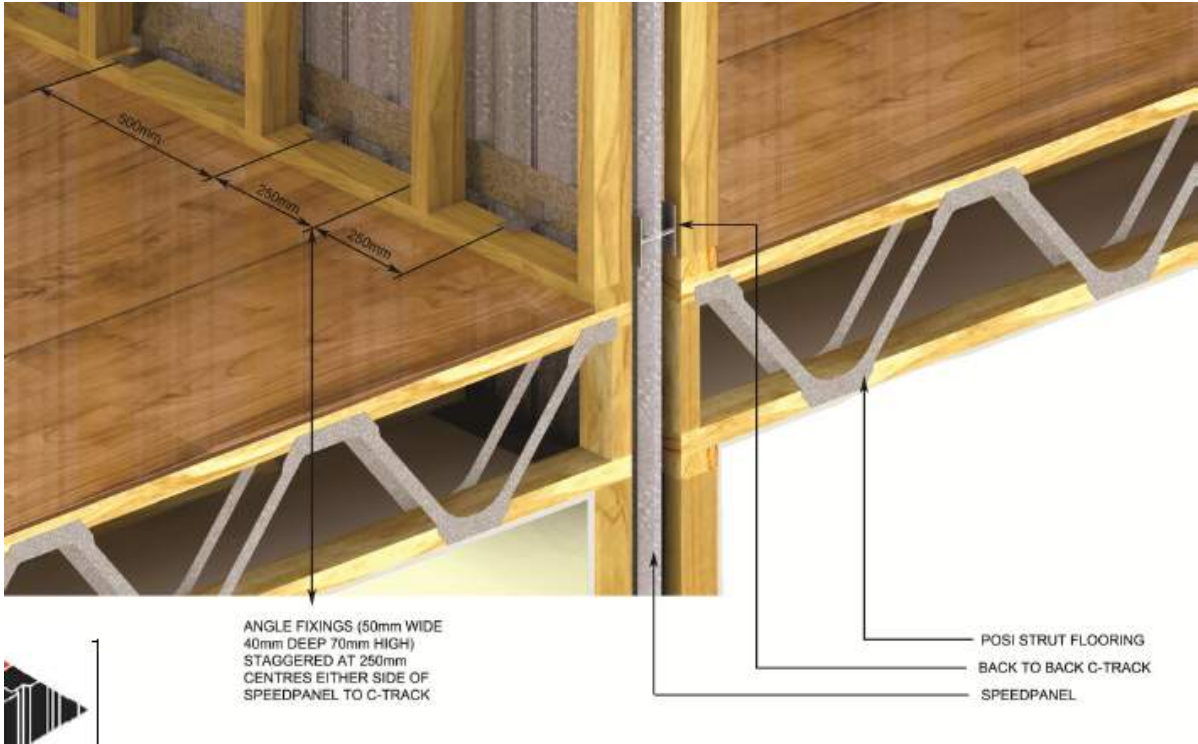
Junction of Partywall and External Wall (Joists are example only)
